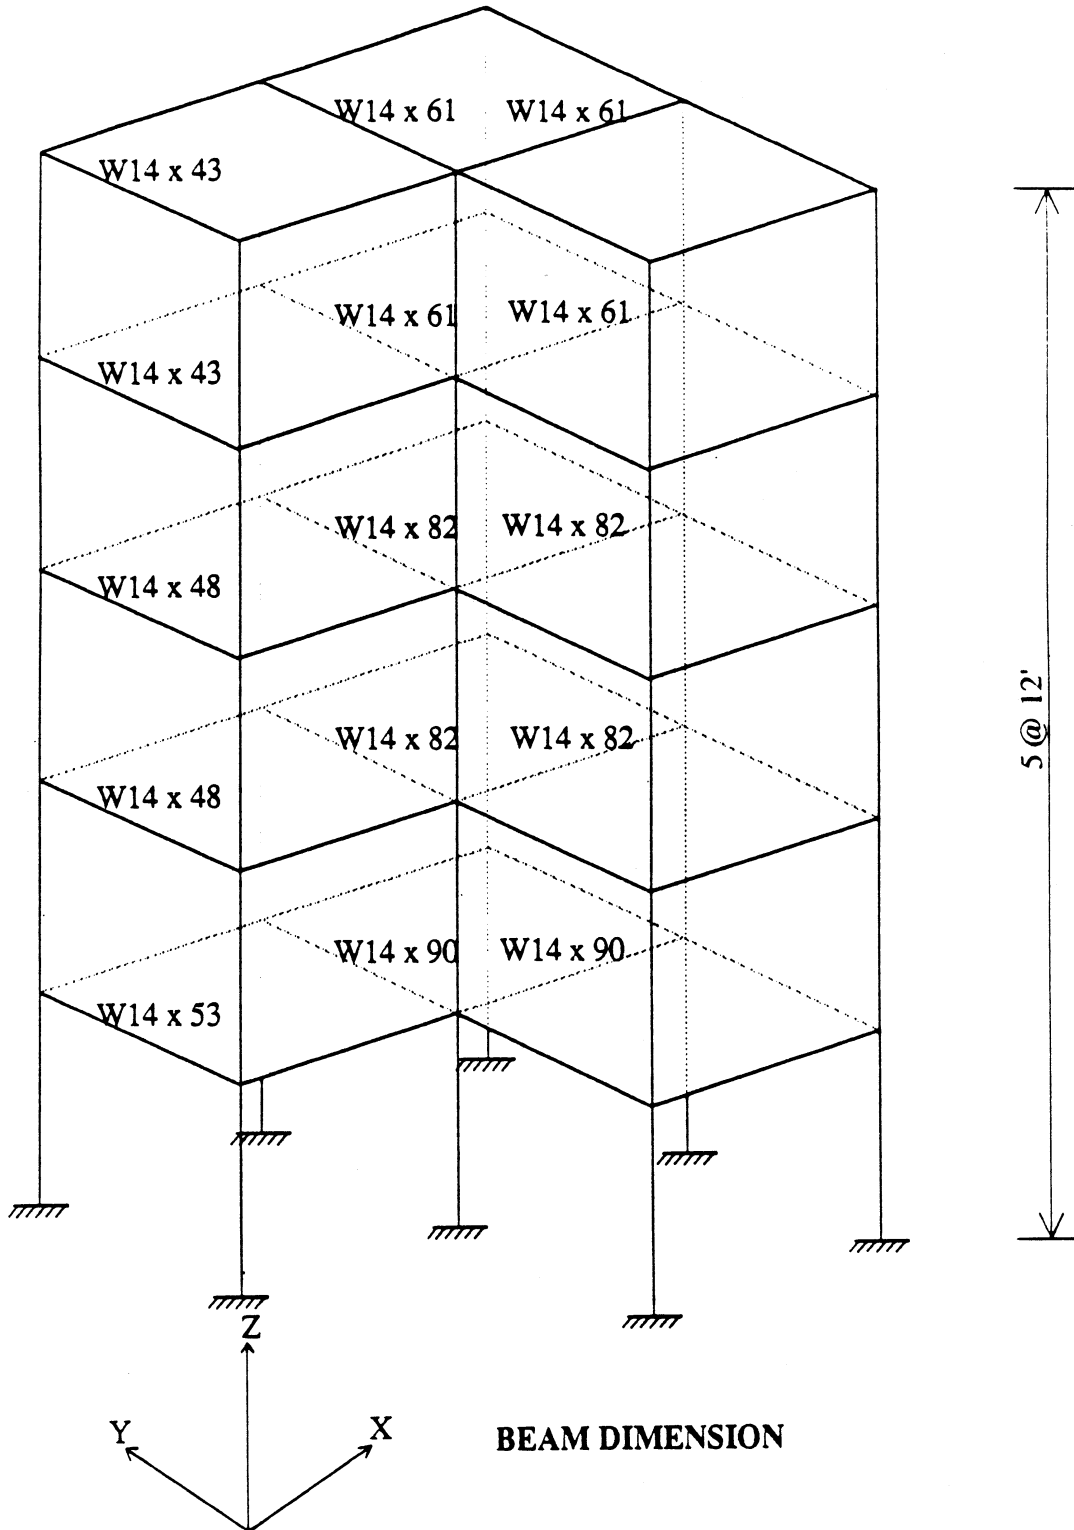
(c) Beam Dimension of Five Story L-Shape Moment Resistant Steel Frame (Continue)
